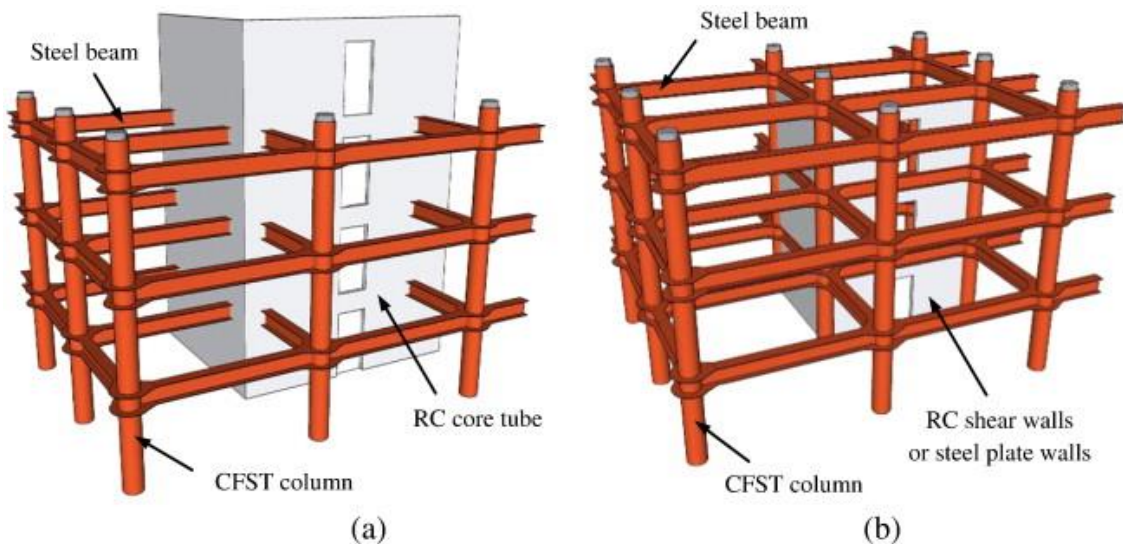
CFT hybrid structural systems for high-rise buildings [Han et al. 2014b]
